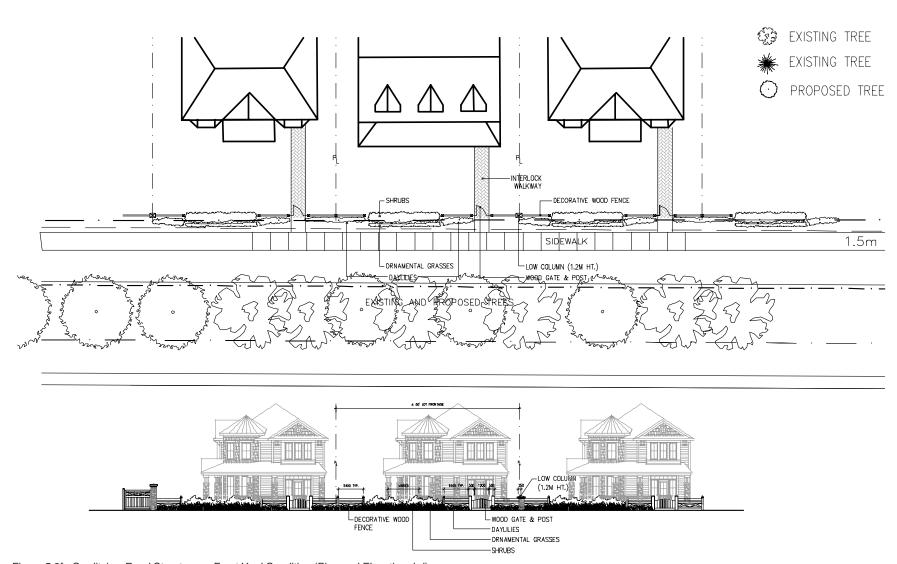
Creditview Road Streetscape Front Yard Condition (Plan and Elevation d-d)
